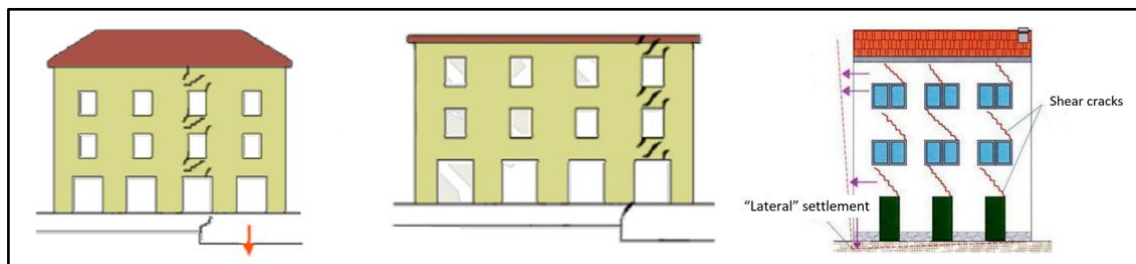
Examples of damages induced by “lateral” settlement on masonry buildings (from Anzani et al., 2008).
